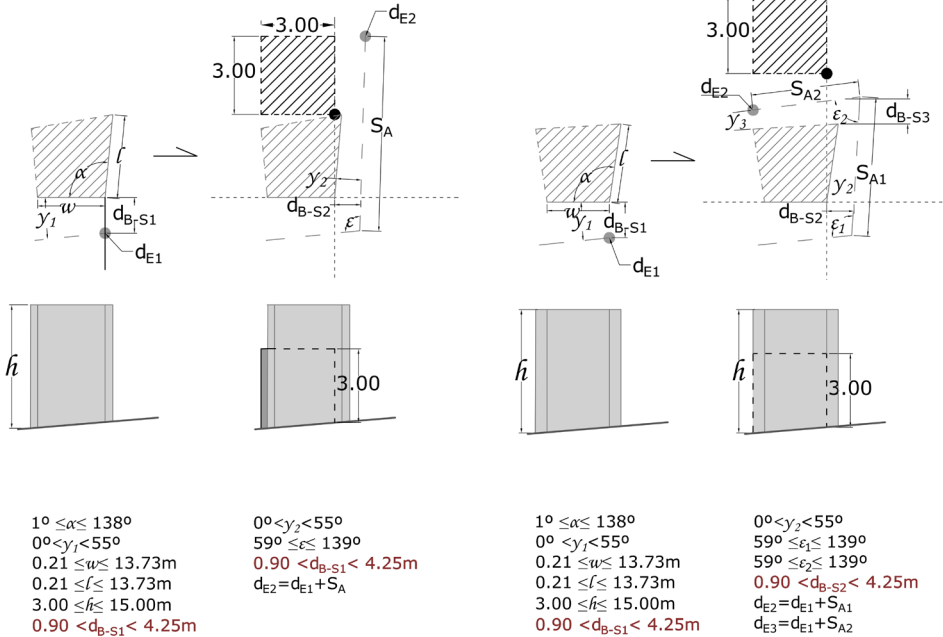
Rule R2 a and b: placing a new building in the second quadrant.
